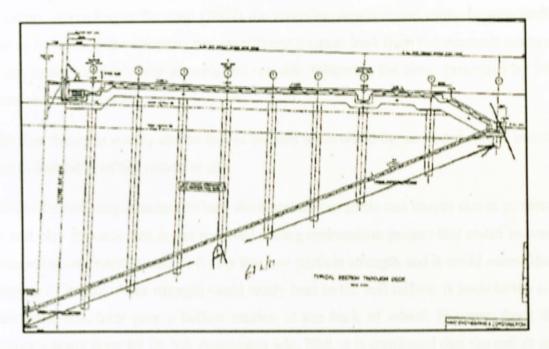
Cross Section Berth 7 & 8 (Source: B 7 & 8 Const. Dra.)
